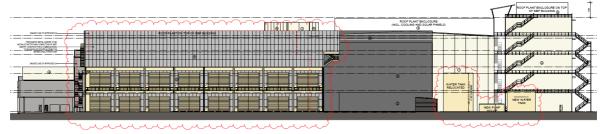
Proposed eastern elevation showing amended built envelope Source: Genton
